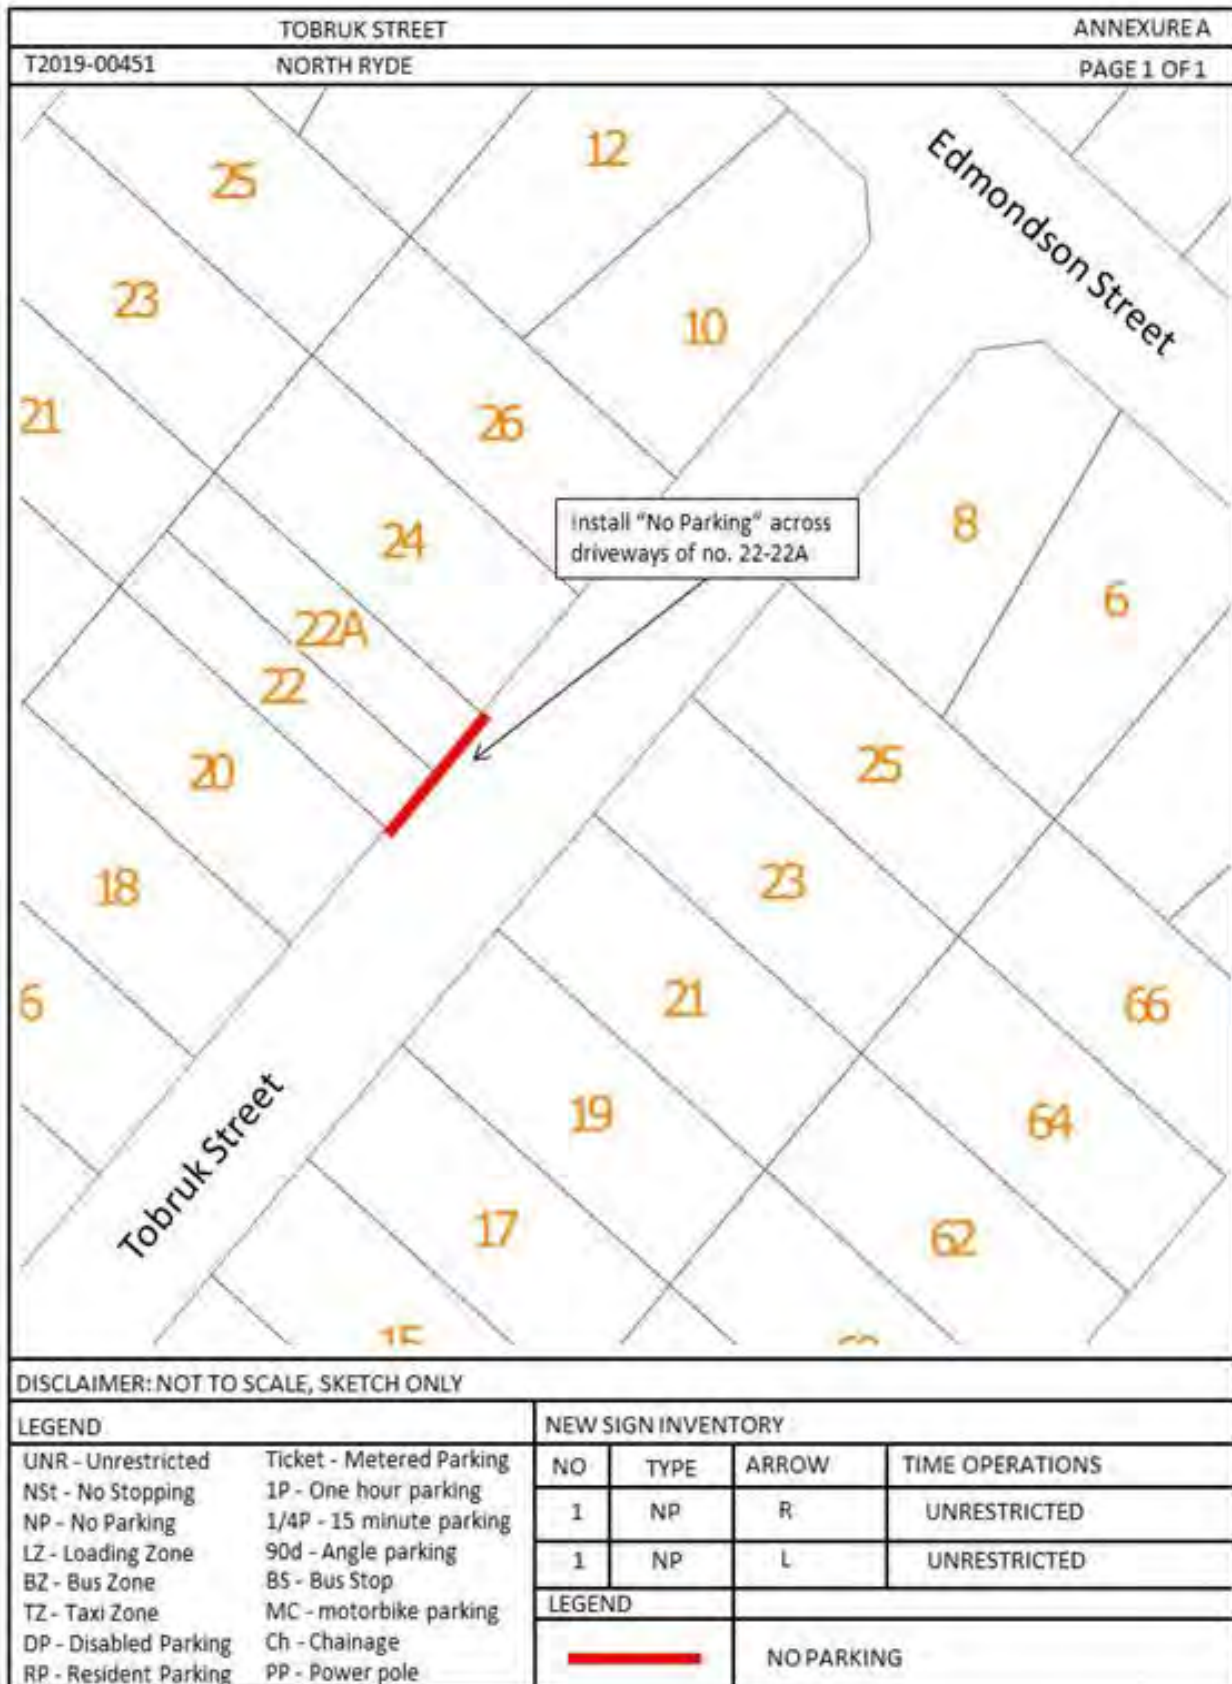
Proposed Parking Changes in Tobruk Street, North Ryde
